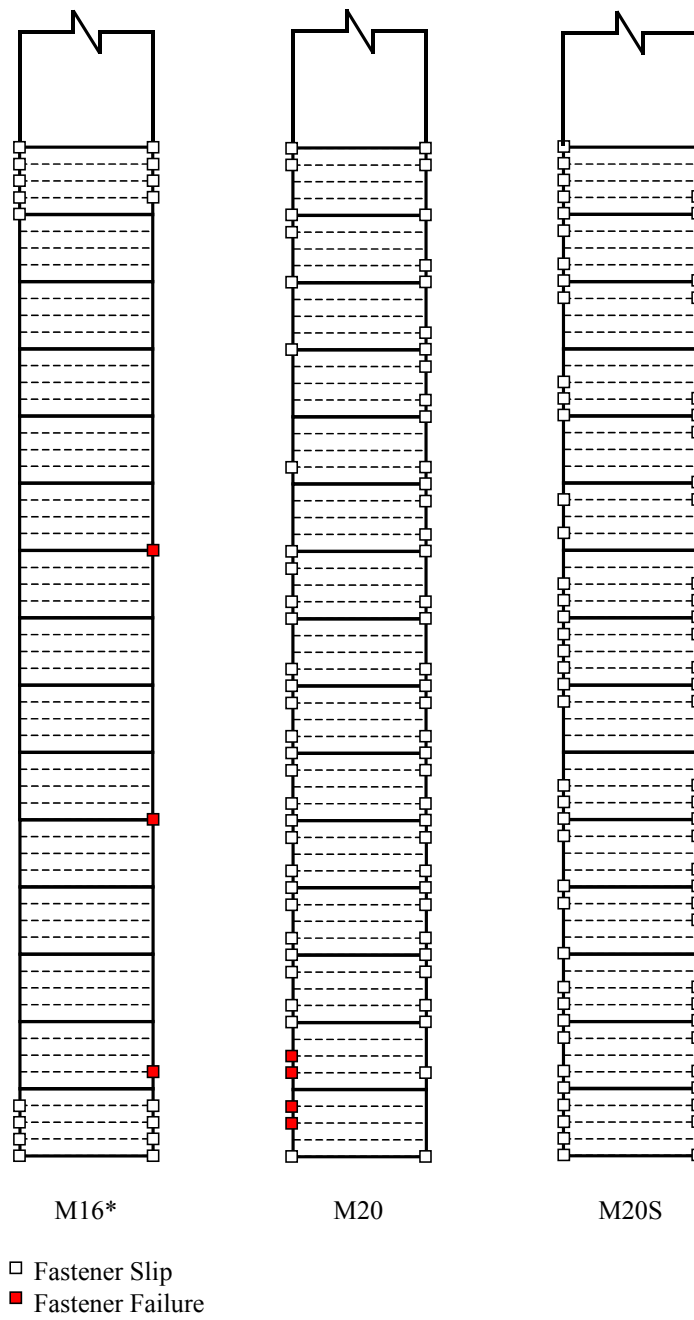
FASTENER CONDITION AT PEAK LOAD FOR METAL-DECK TESTS
